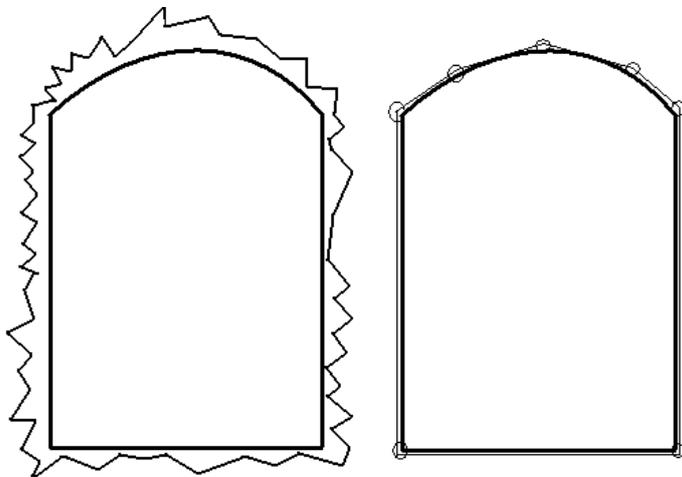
The theoretical tunnel contour and the amount of overbreak depending on the excavation method: blasting to the left and wire cutting to the right.
